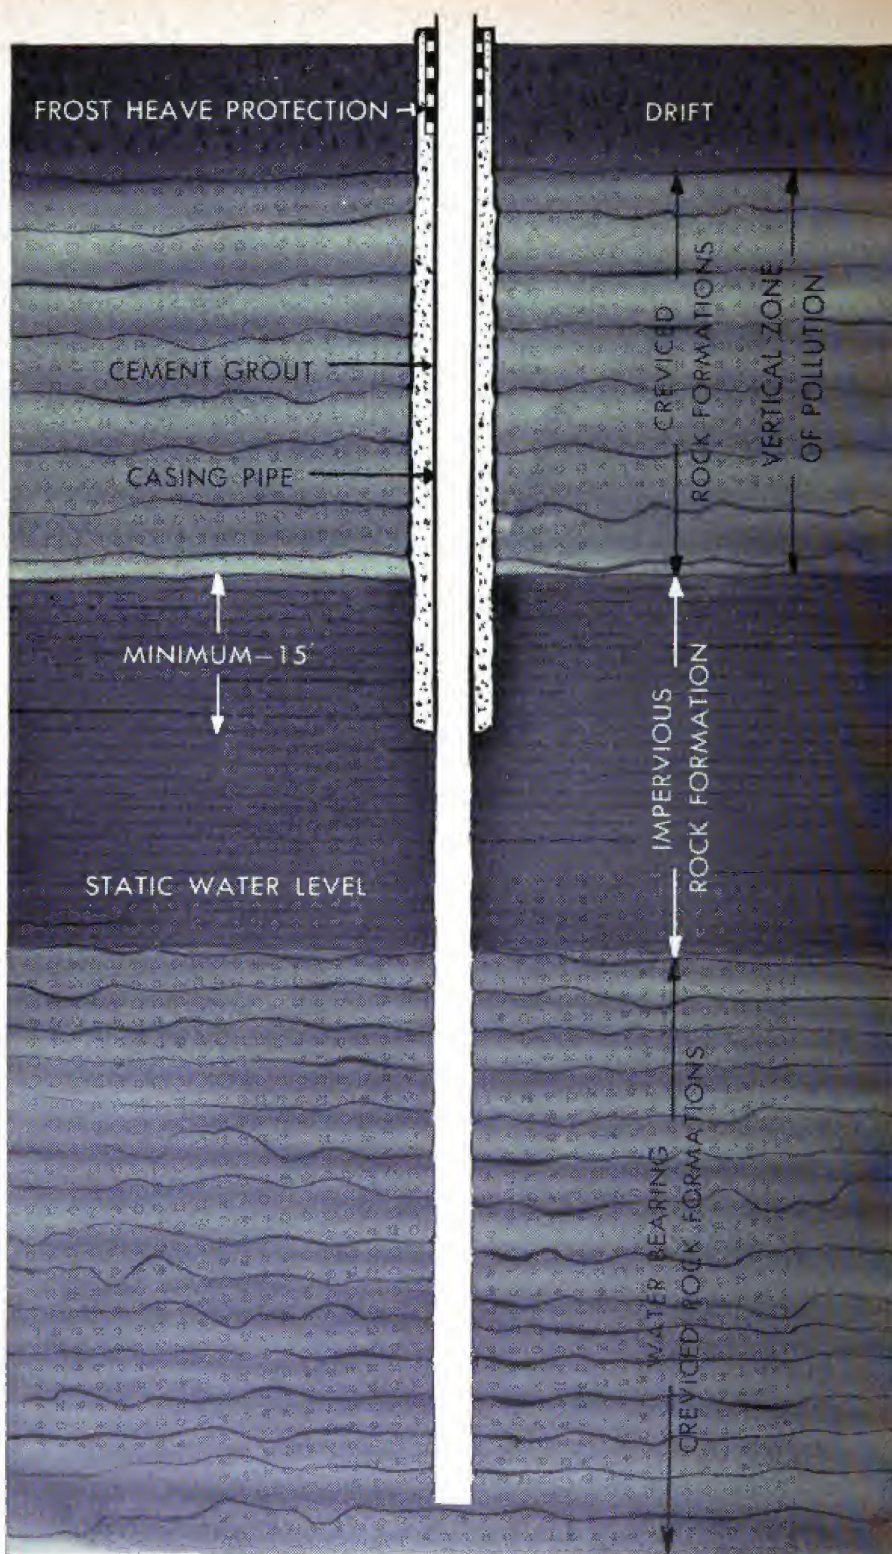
Construction of well with grouted casing pipe terminating in an impervious stratum below a creviced rock formation.
